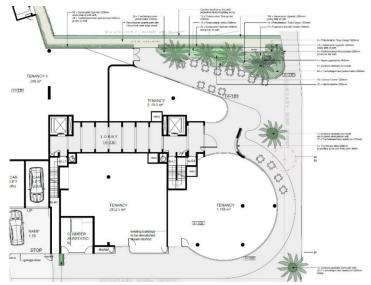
Landscape Plan Ground Floor (Courtesy of Dangar Barin Smith)
